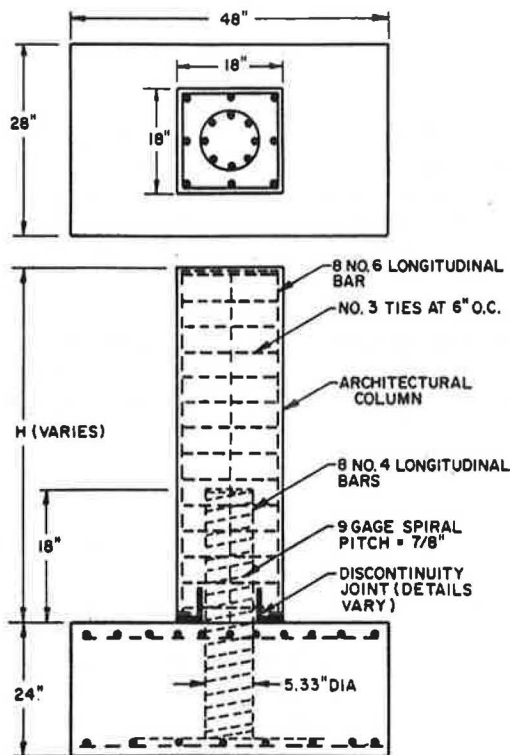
Typical 1:6-scale specimen dimensions and reinforcement.
